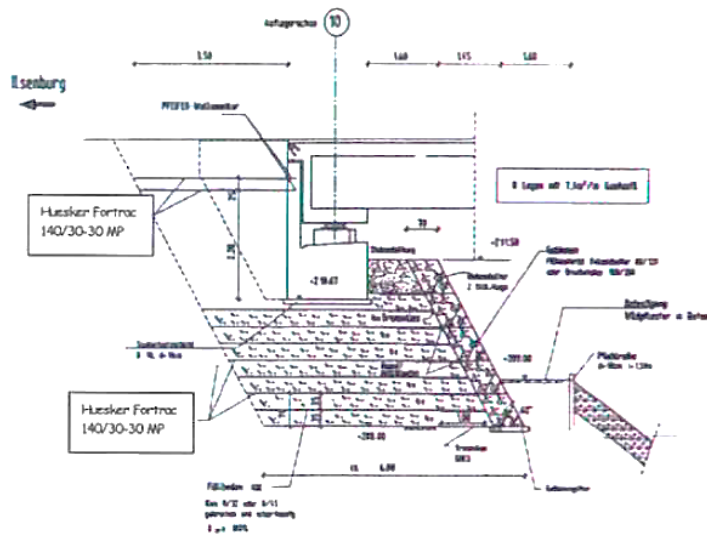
Cross-section of Ilseburg Bridge abutment (Herold 2002).
